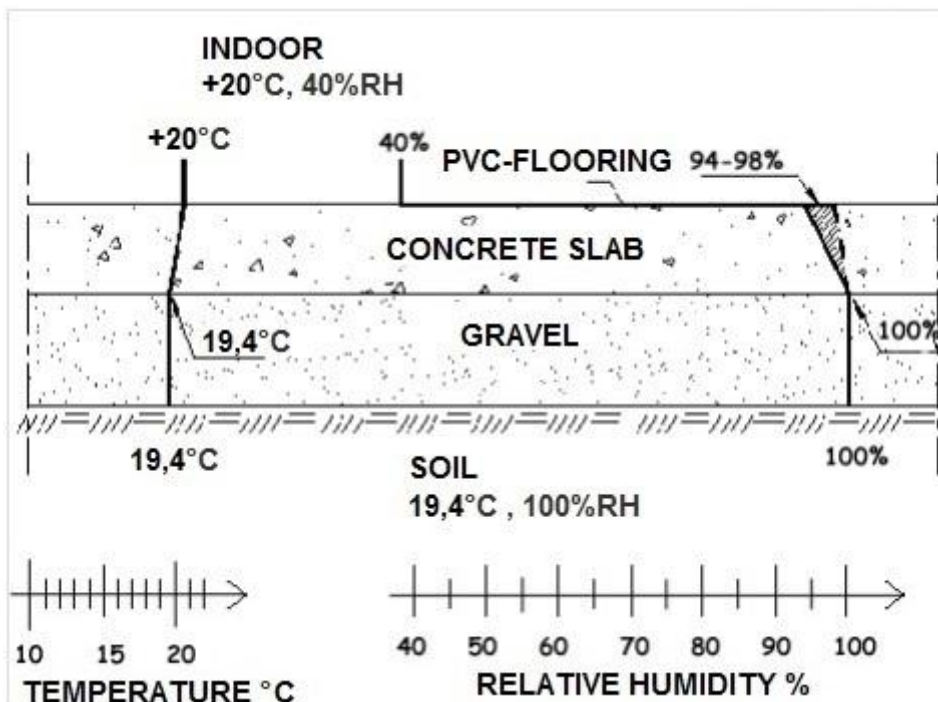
Expected humidity levels in a concrete slab with PVC flooring and no moisture barrier or thermal insulation under the slab
